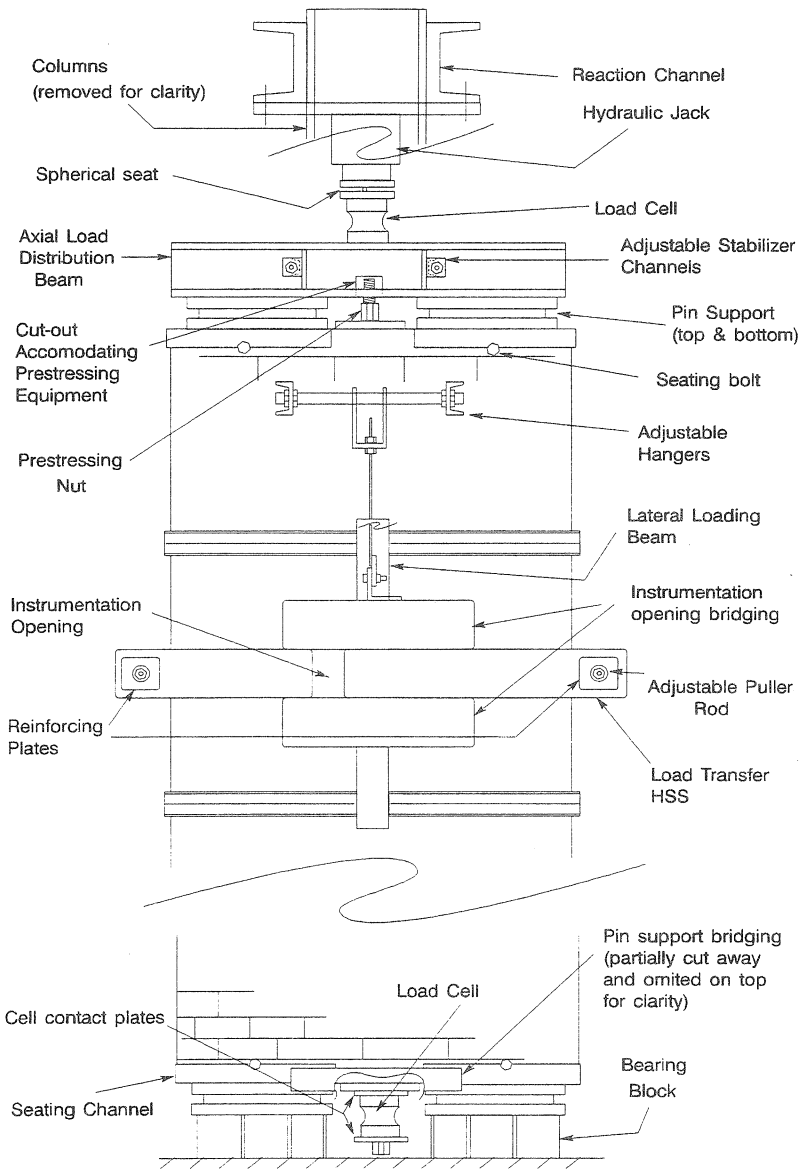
Face elevation of the compression side of the test set-up and reaction frame.
